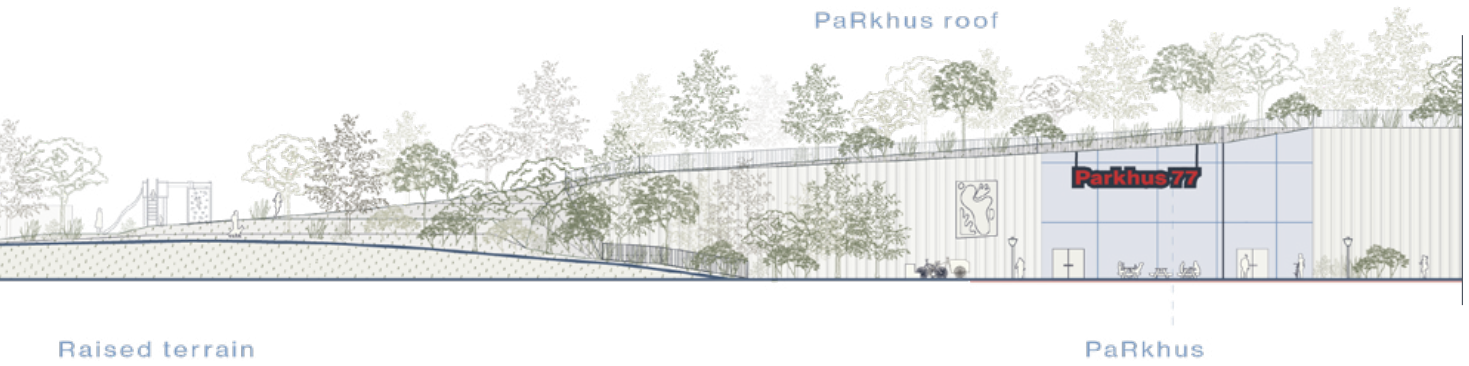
Section D-d - Pier 3 proposal (1 : 500).
